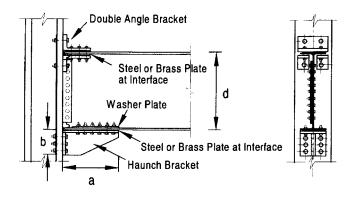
Minimum Recommended Modifications and Overall Dimensions
